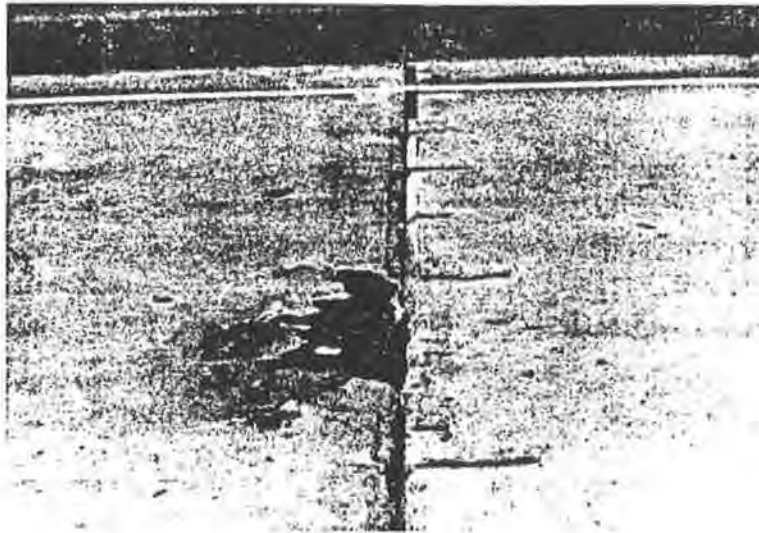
Angle Joint with Portions of Angle Missing and Local Concrete Cracking and Spalling [16].
